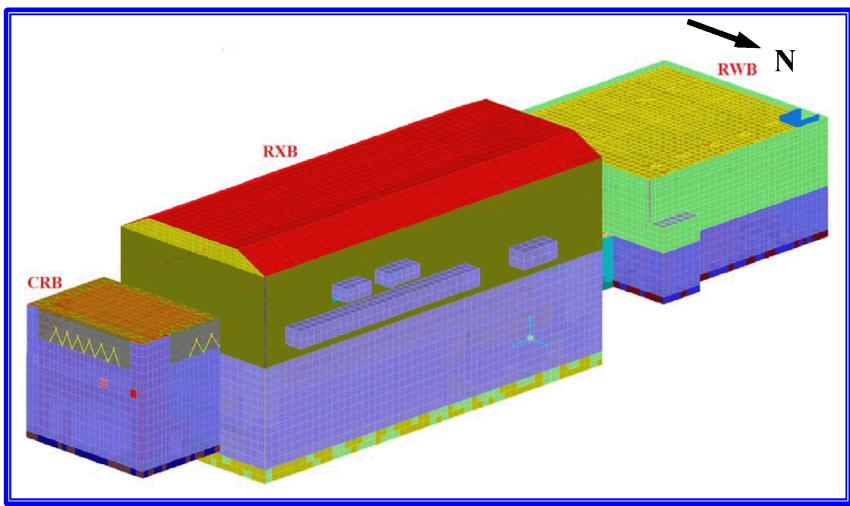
Isometric View of Backfill Soil Elements around the Three Buildings
